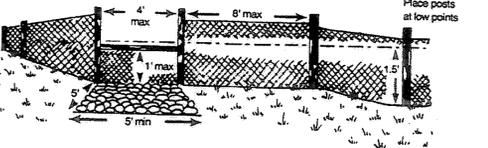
Perspective of reinforced, stabilized outlet for sediment fence.
